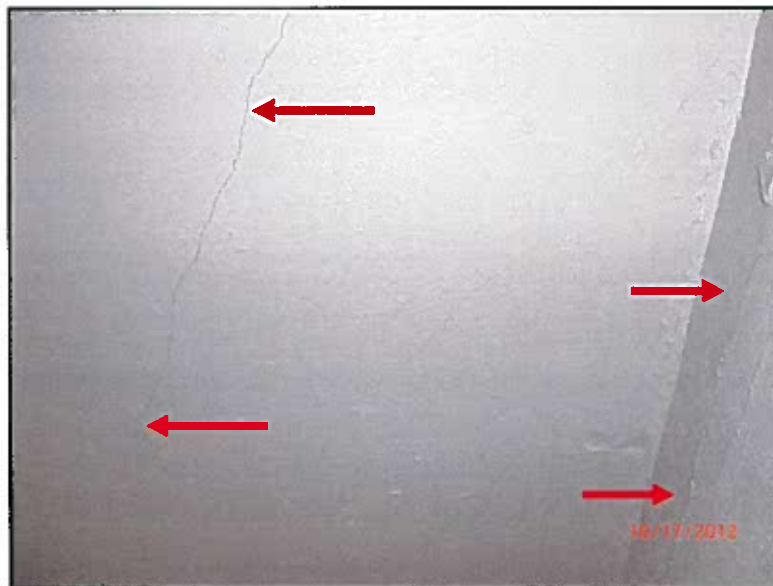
slab cracking at column drop panel next to Parking Space 210
